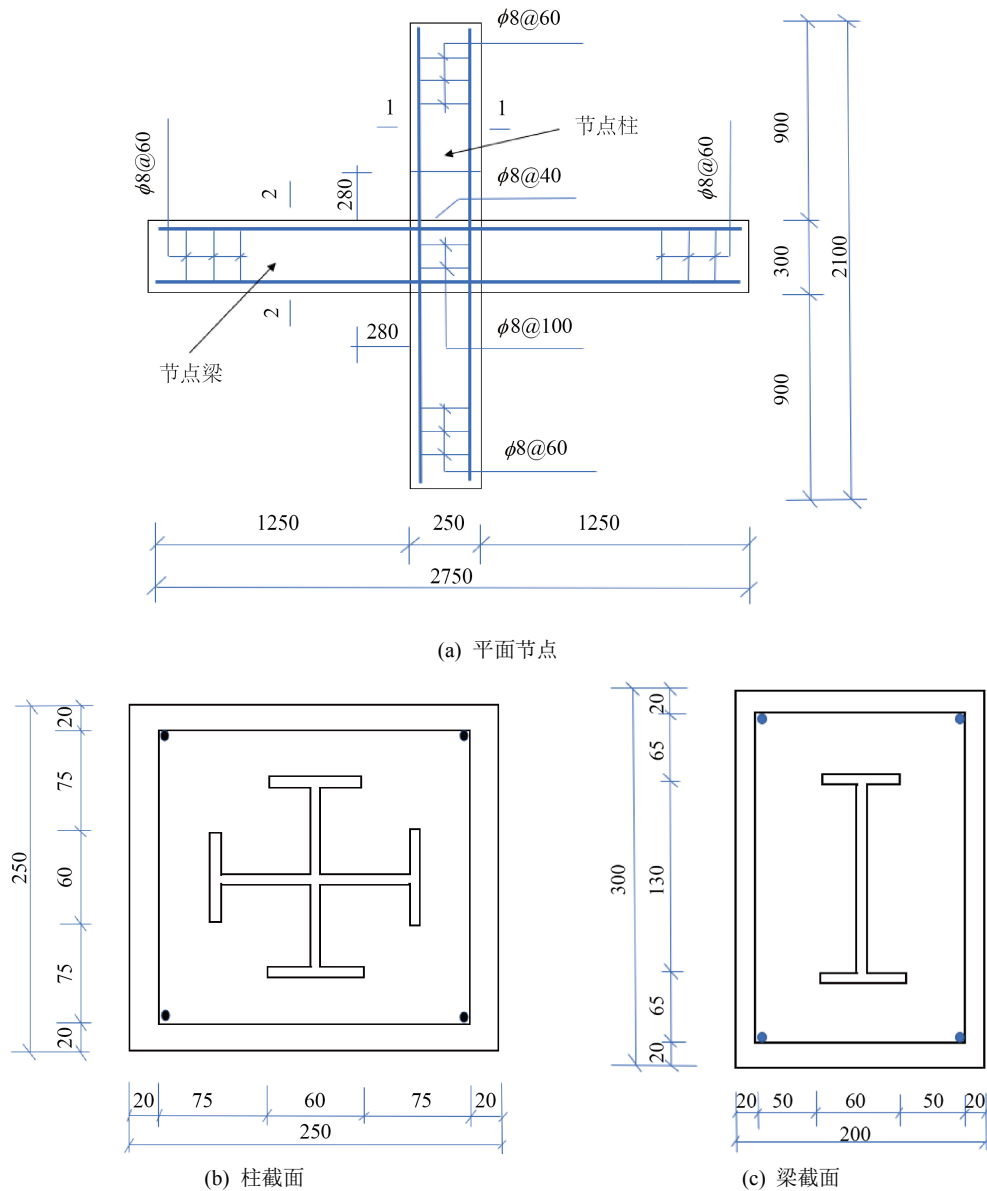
Reinforcement arrangement and section shape of specimens (unit of length: mm)
